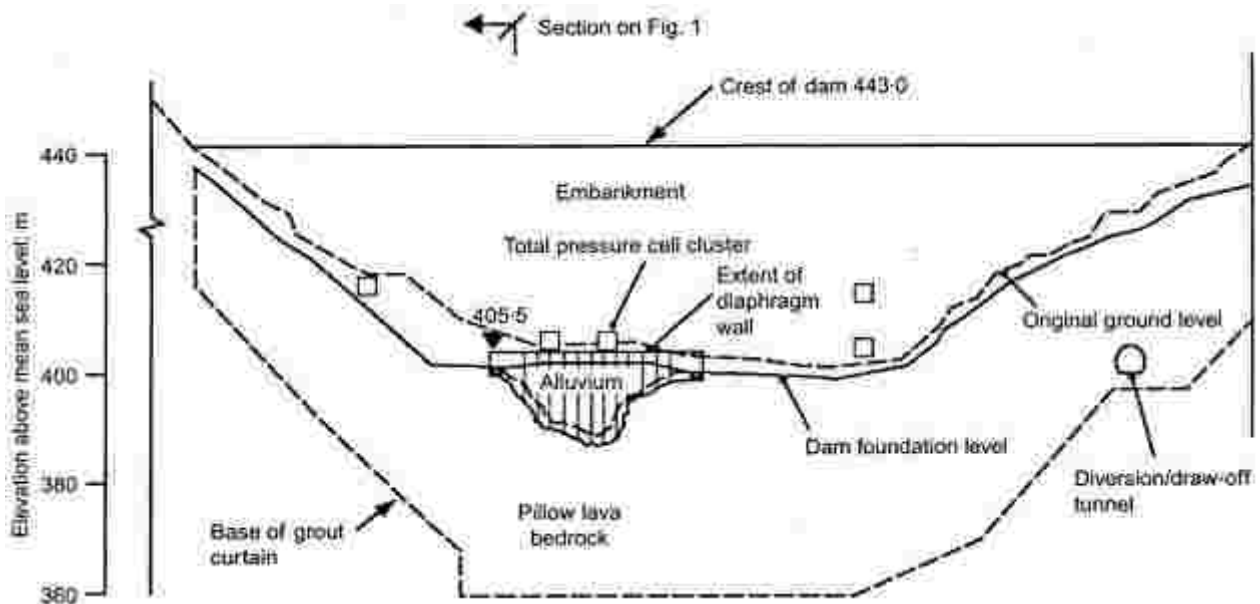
Arminou dam: Longitudinal section along dam axis looking downstream
